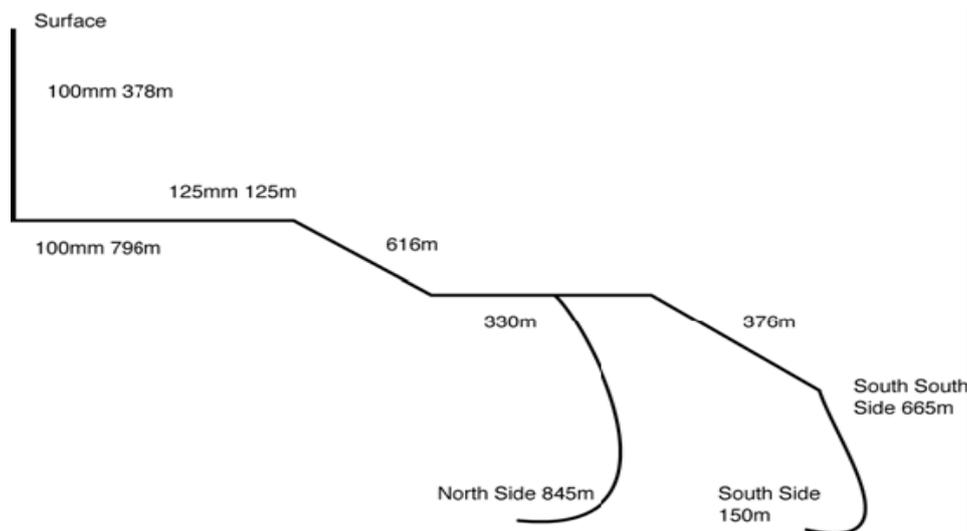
Current Hydraulic Fill Reticulation Route at No.3 Shaft underground (KCM Expansion Projects)¹¹
